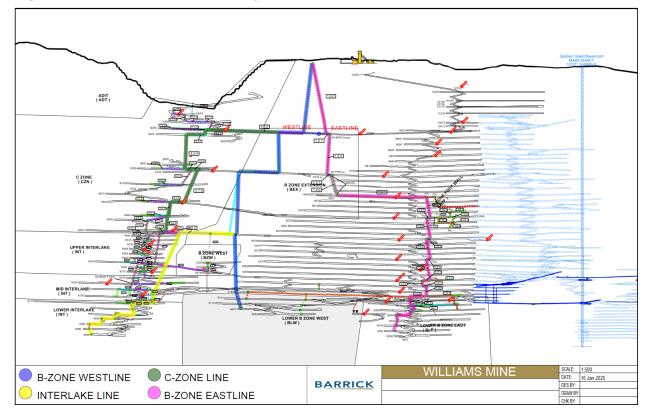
Schematic of January 2025 Paste Reticulation Plan
